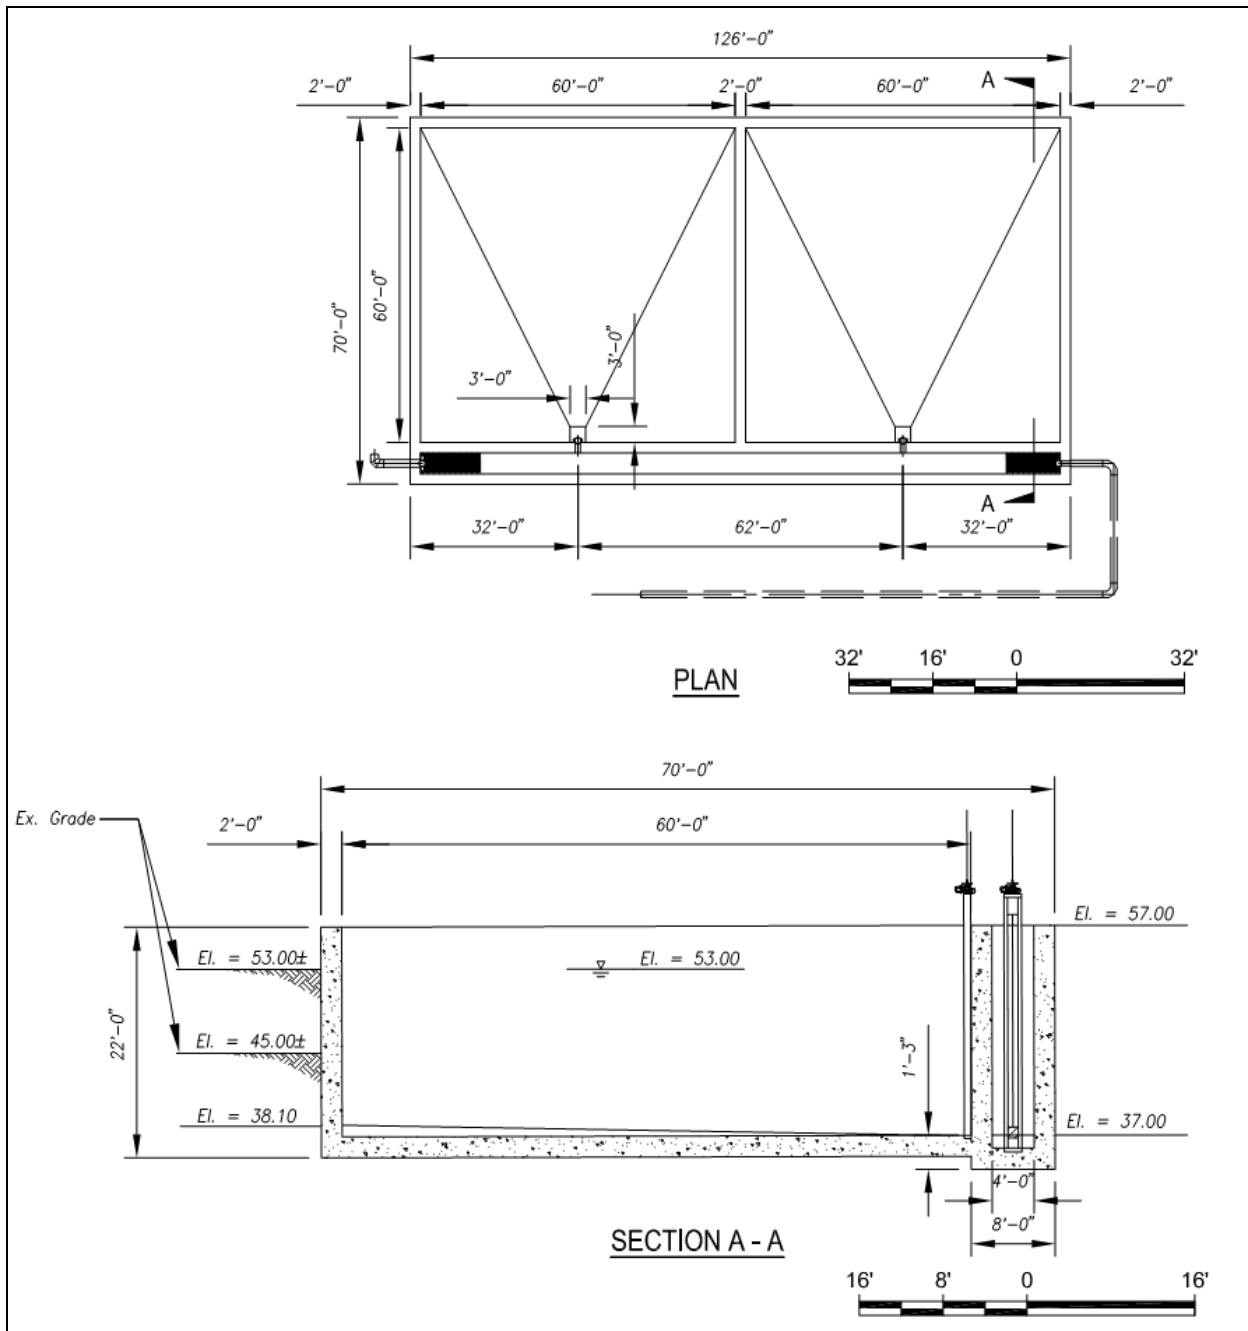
Option 3A – Plan and Section Views – 0.84 MG EQ Basin at Site of Ex. Storage Tanks
